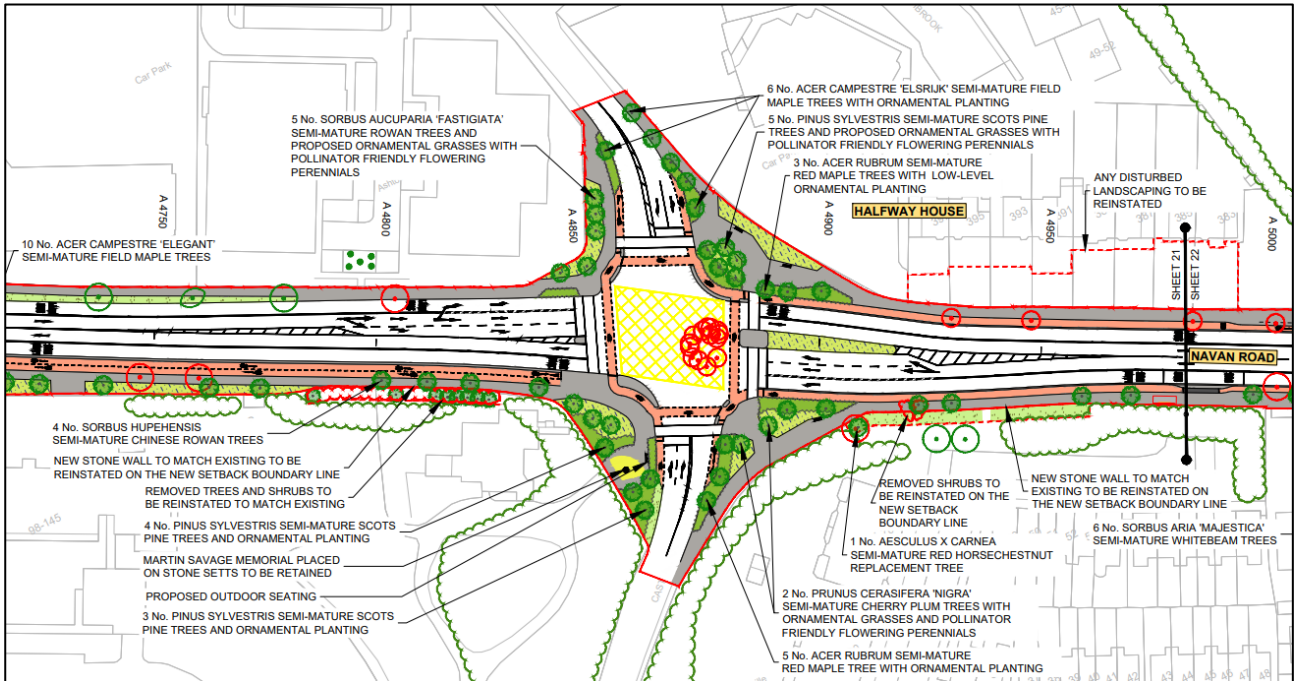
Proposed landscaping at Ashtown Road Junction (as extracted from Landscaping General Arrangement Drawing)
